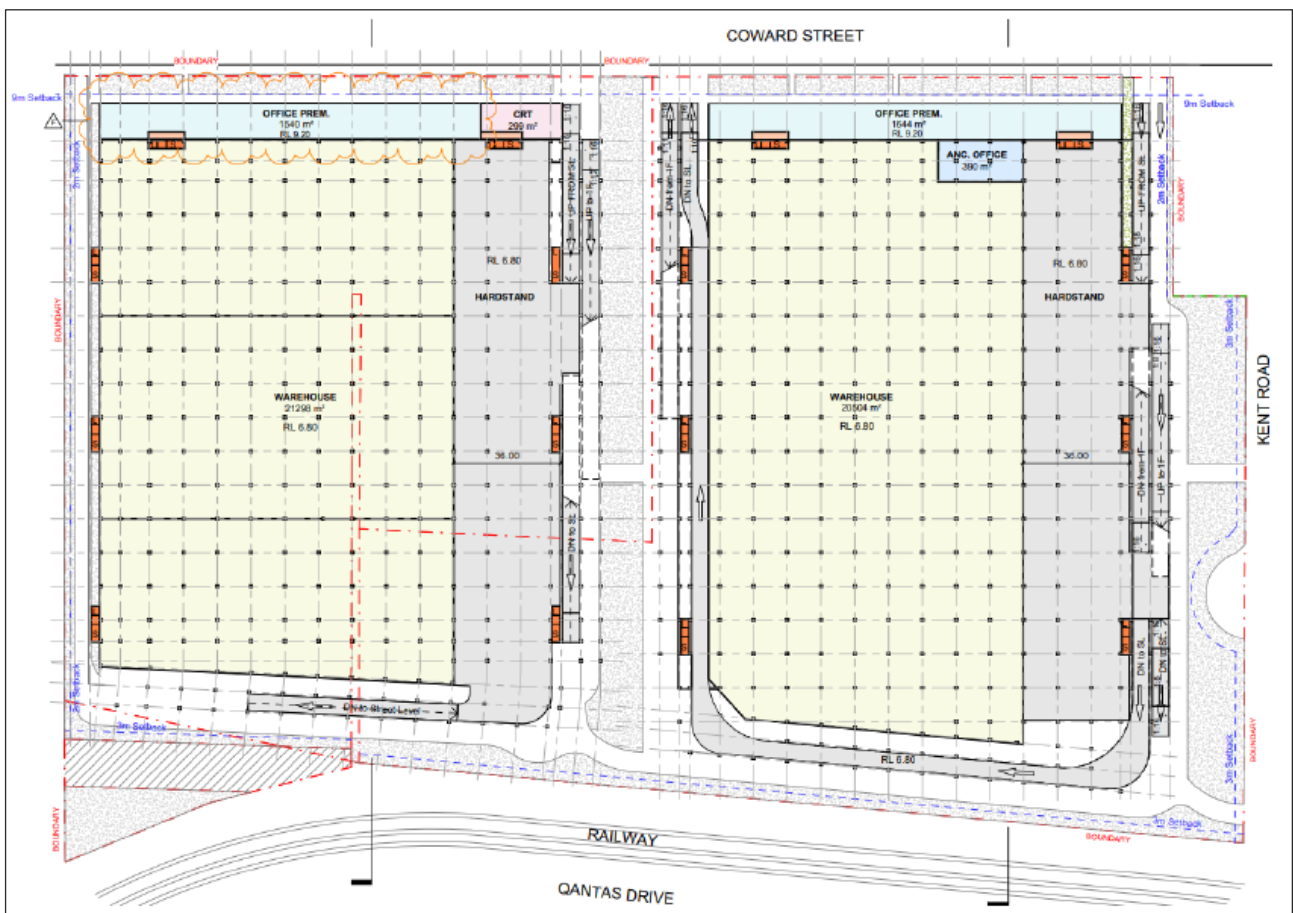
Development Concept – ground floor plan (source: Planning proposal, 2023)
